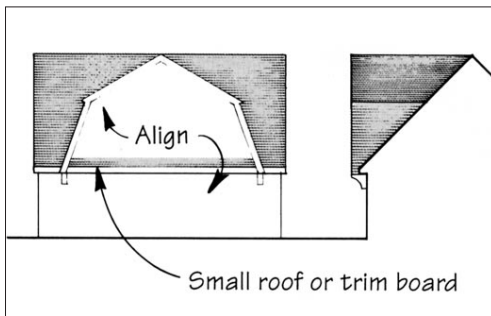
A gambrel dormer can add more space without looking as out of place as a large shed dormer. The author prefers one with an overhang (right), "supported" aesthetically by brackets.
